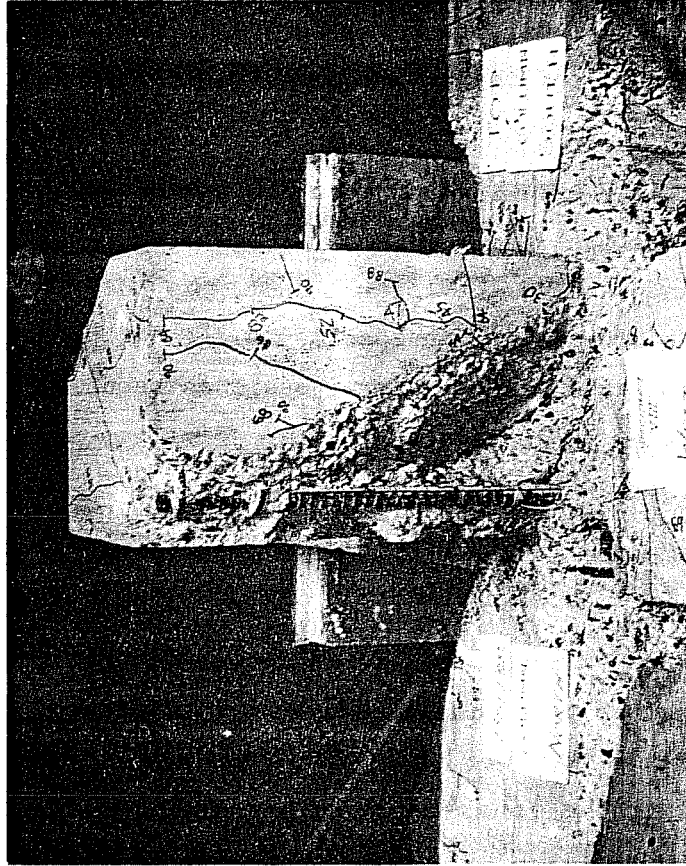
Origin of cracks reflected on sides of lateral beam of Specimen VIII
